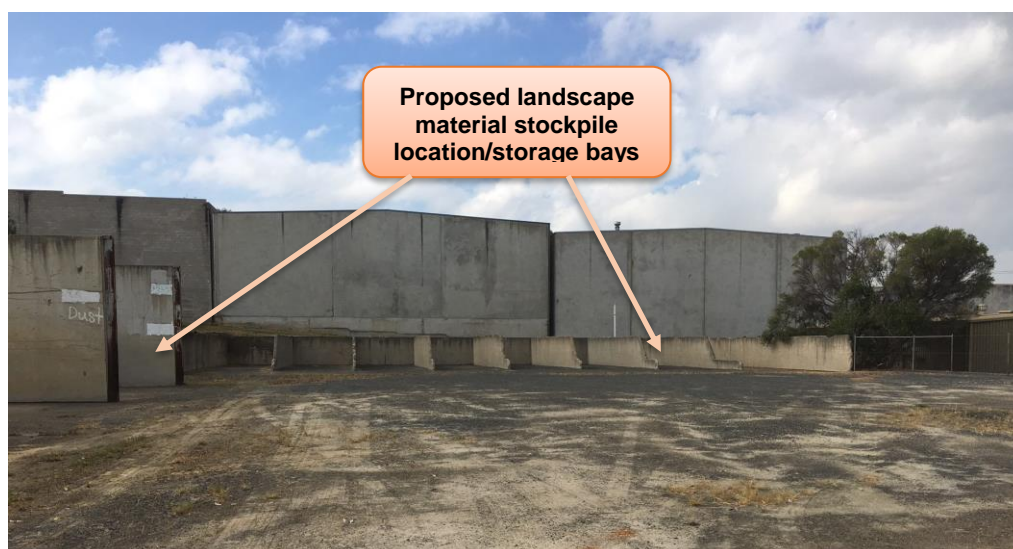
Existing Concrete Bays to be Utilised for Stockpiling Purposes as Part of the Bulk Landscape Supplies Facility
